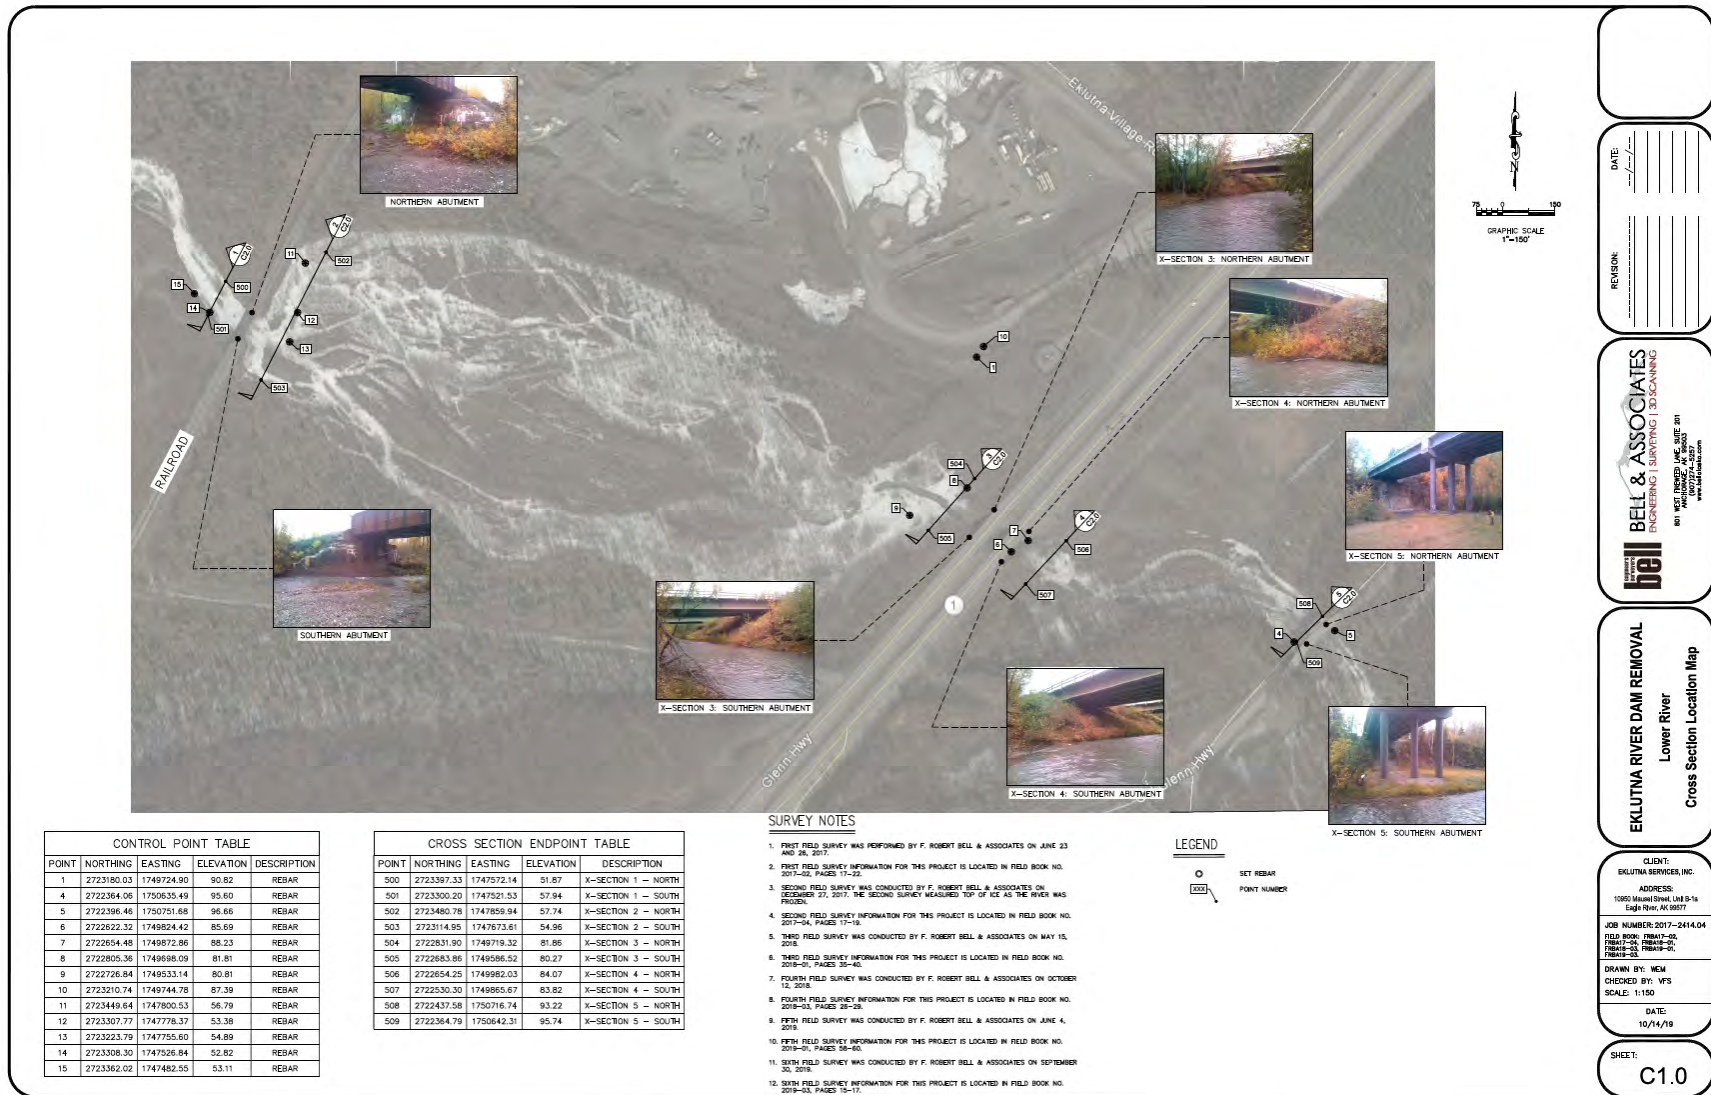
Eklutna Inc. bridge monitoring cross sections Map 1 of 2.
